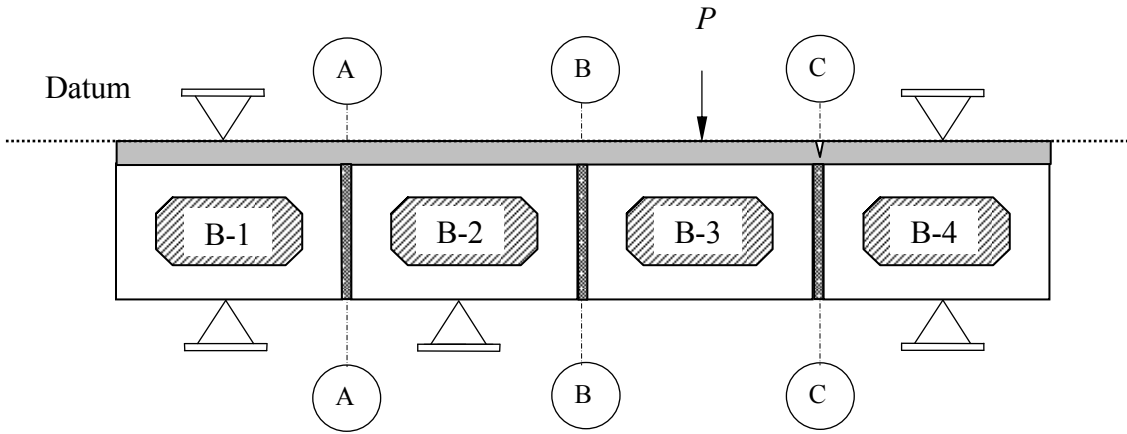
Loading arrangements for cracking the exterior shear-key B-B.
